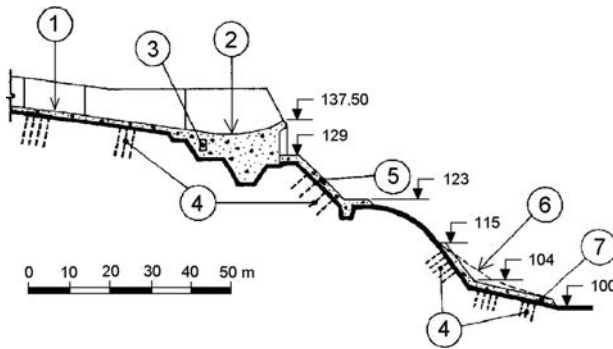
Itaipu*, spillway structure – section B–B (after Schulman et al., 1988). (1) Spillway chute; (2) flip bucket; (3) drainage gallery; (4) anchor bolts; (5) slabs for the protection of slopes; (6) line of the rock; (7) protective wall.
